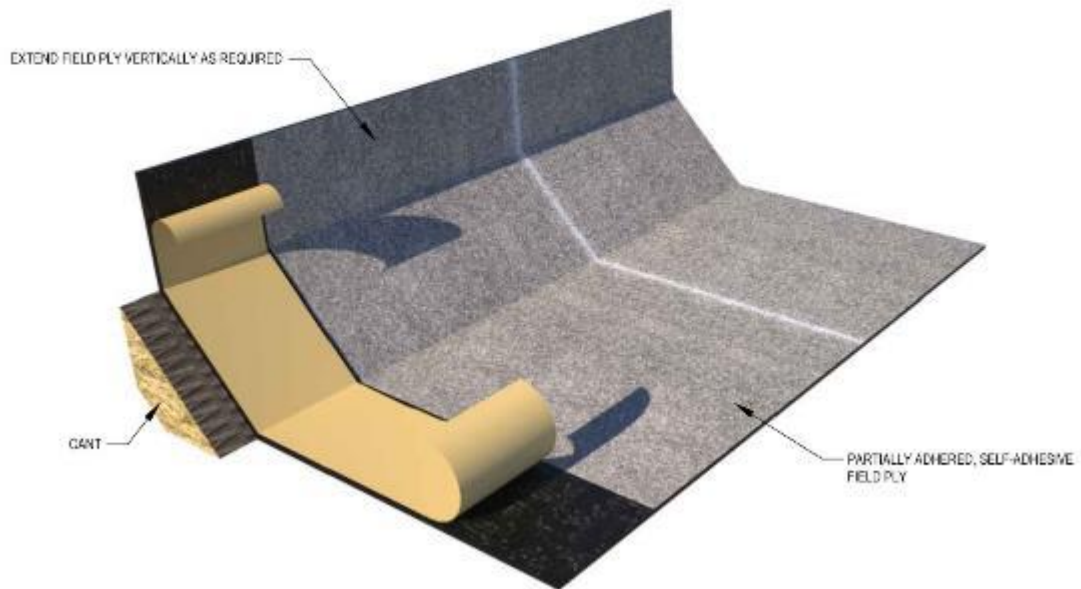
Partially Adhered, Self-Adhesive Vapor Retarder Termination at Wall/Curb With Cant
